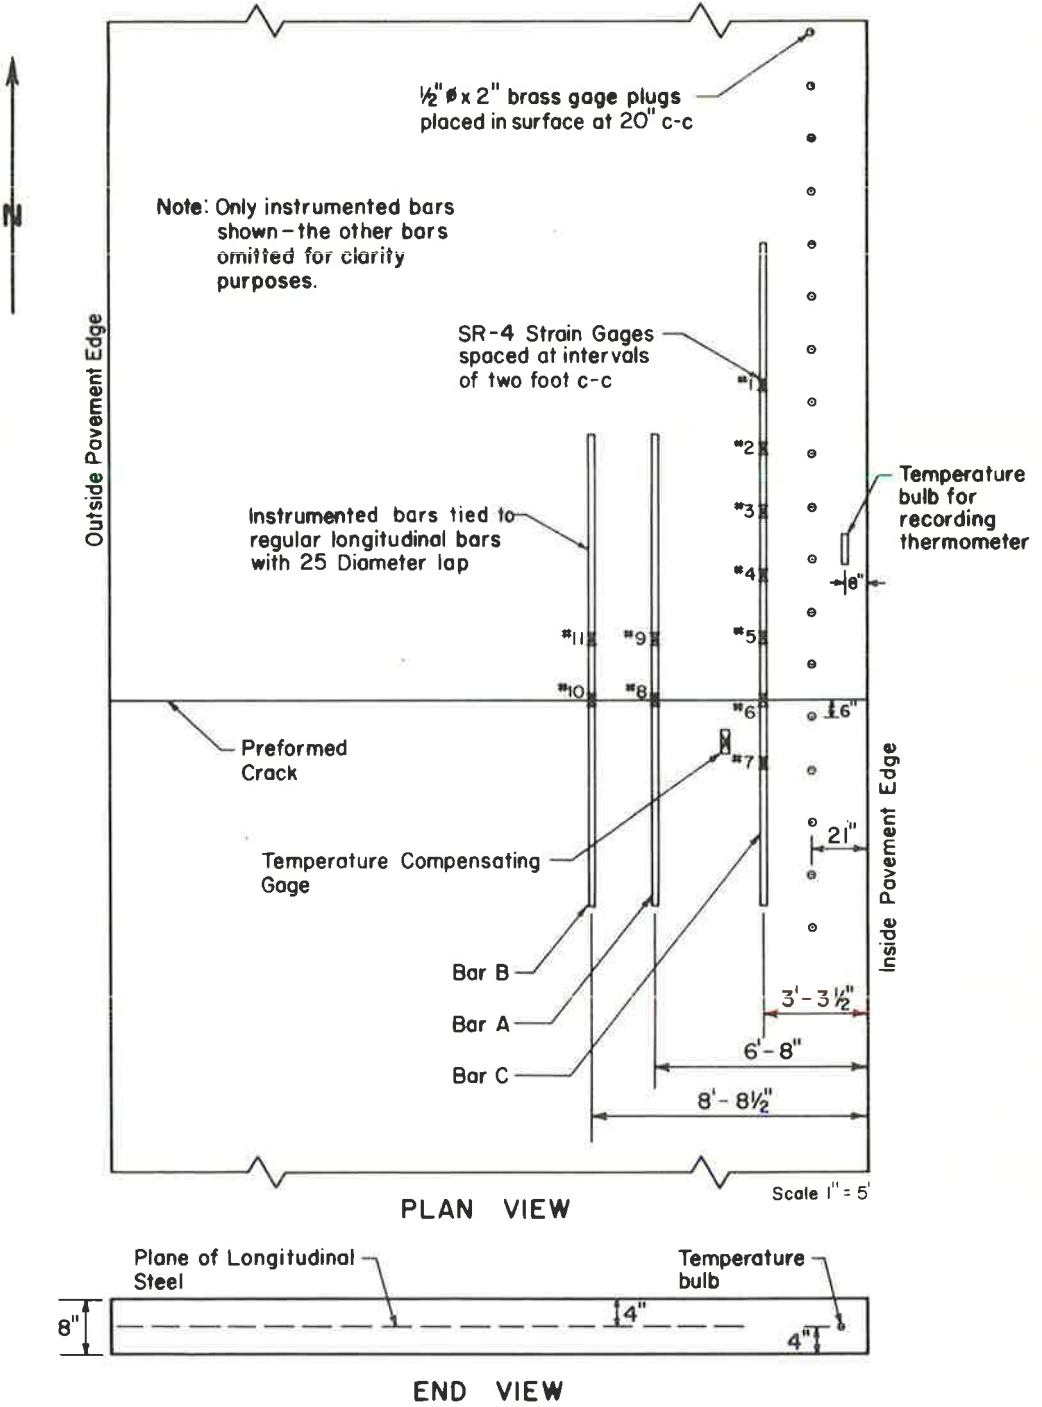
Detailed layout of instrumentation for pavement with 0.6 percent longitudinal steel (SBL), Walker Co.
